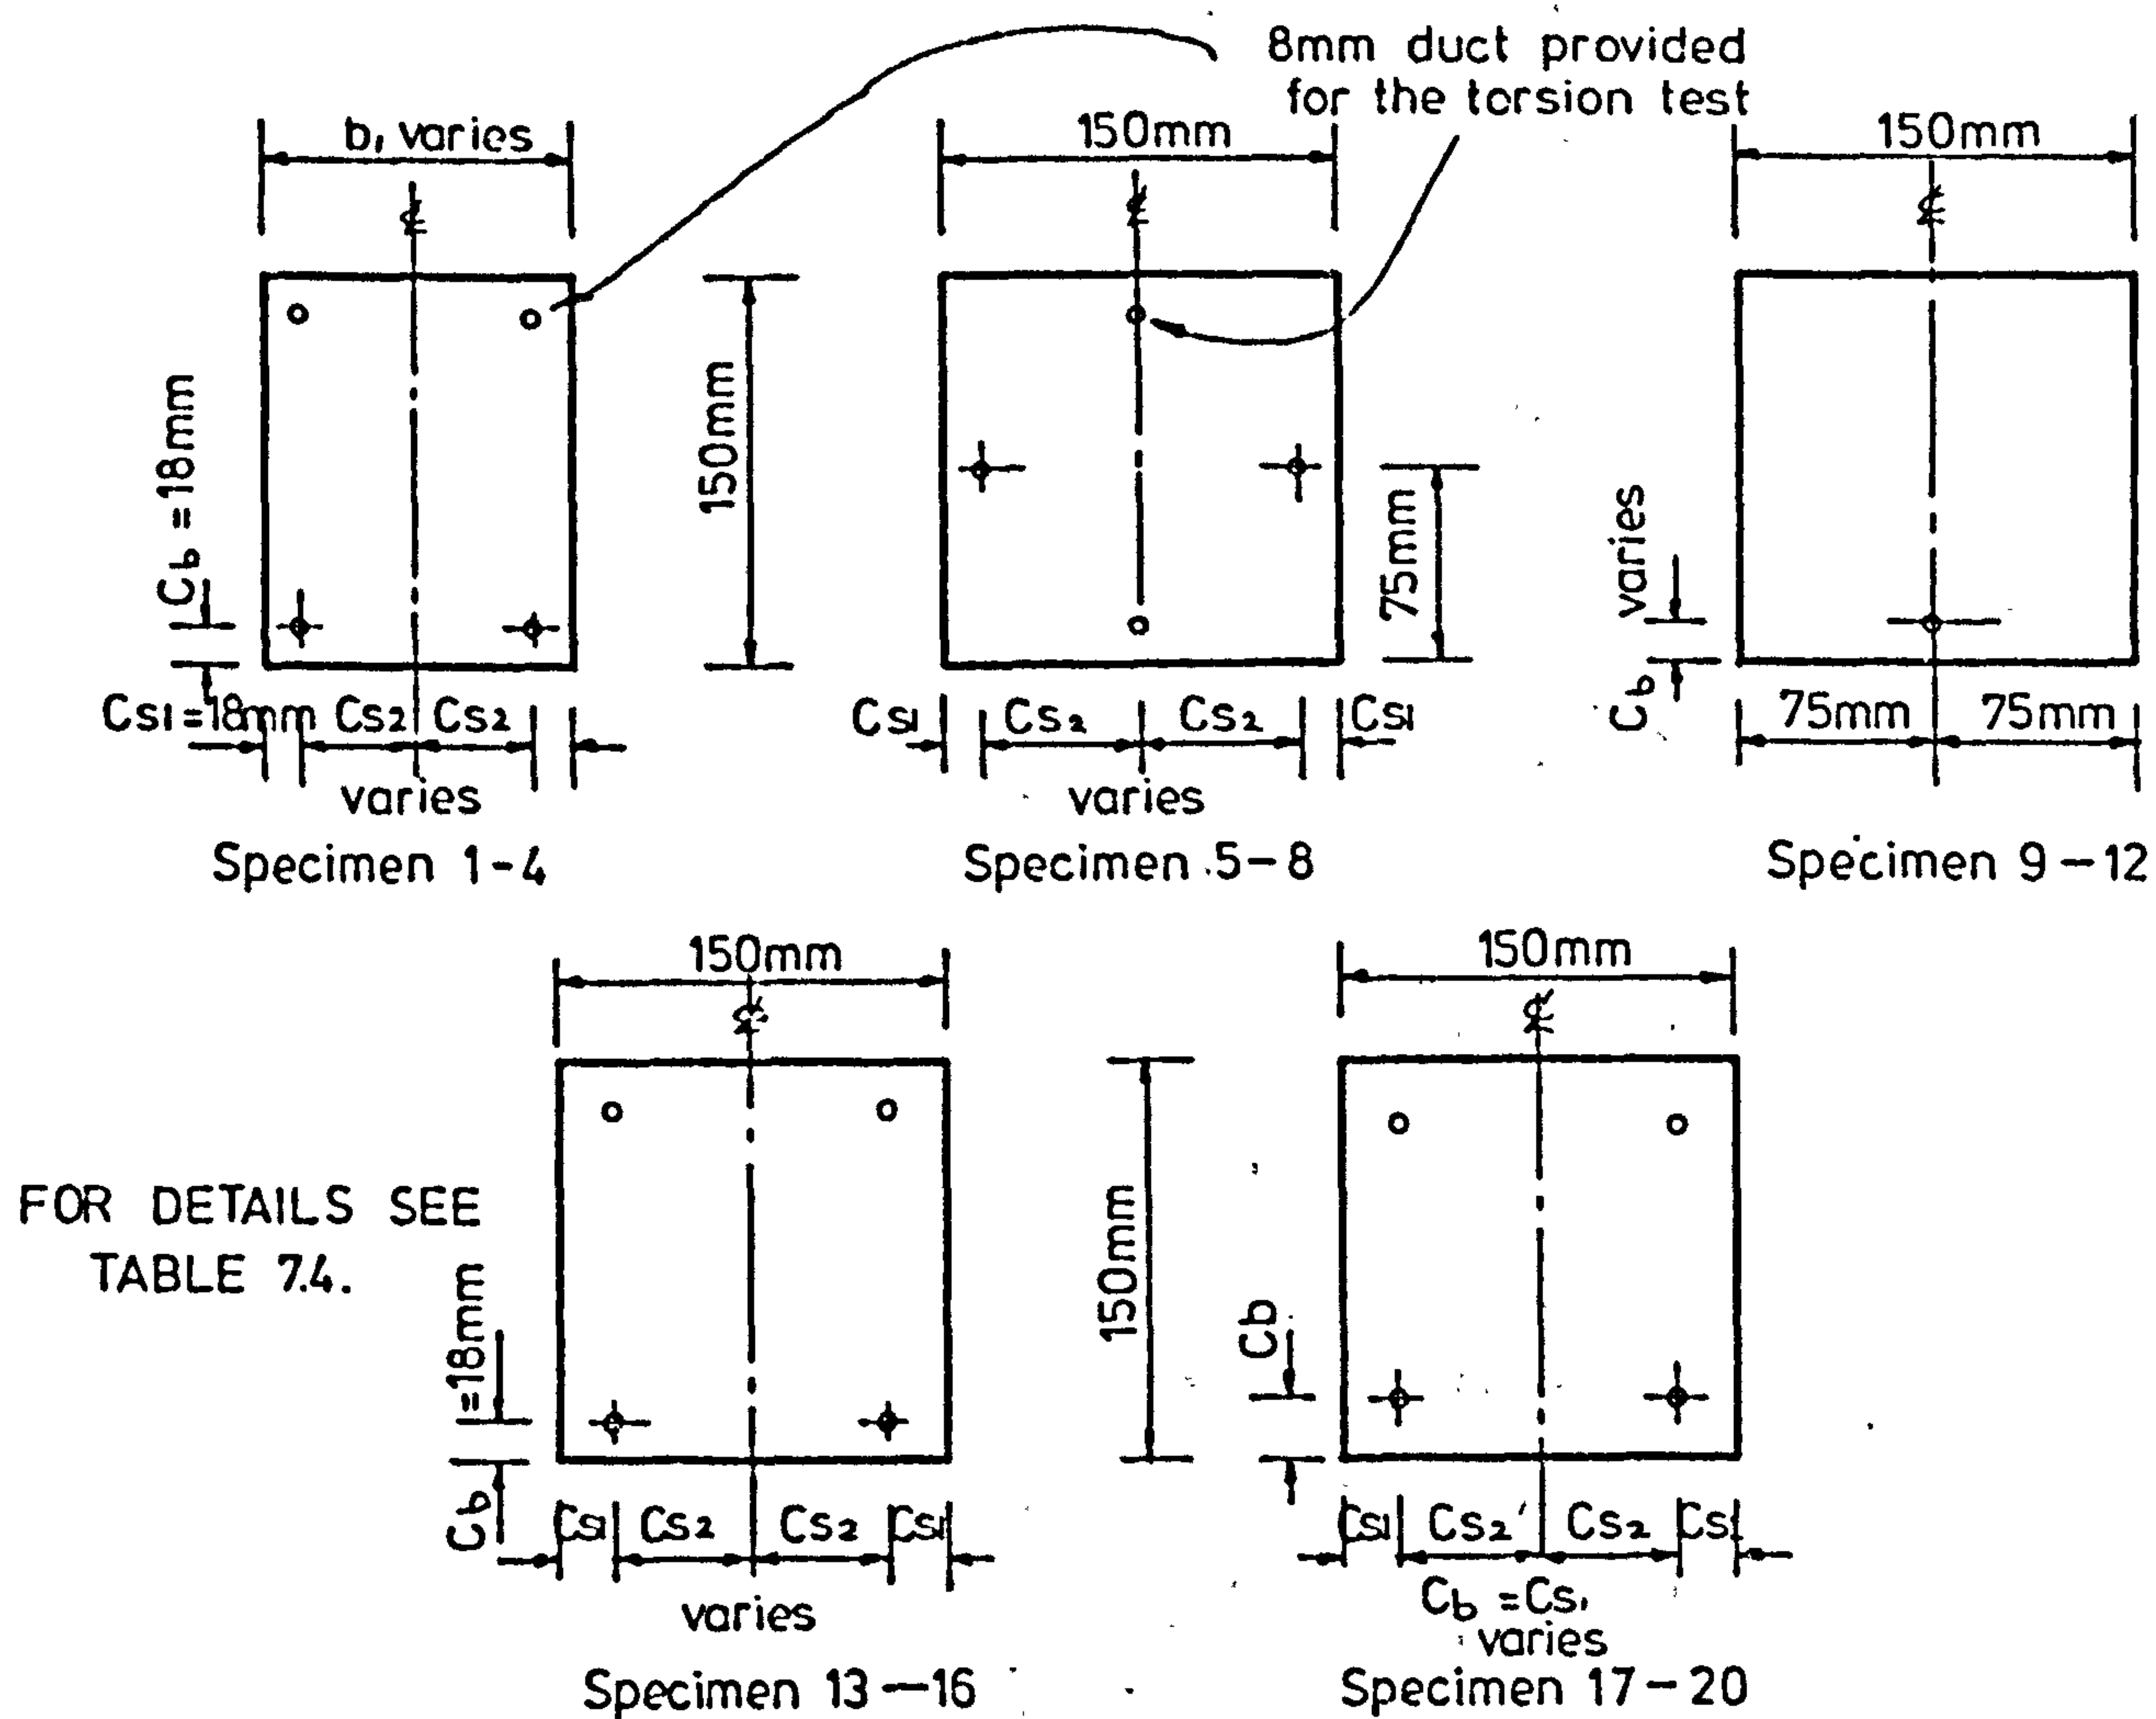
Cross sectional detail for specimens used in the wide width specimen torsion tests .
